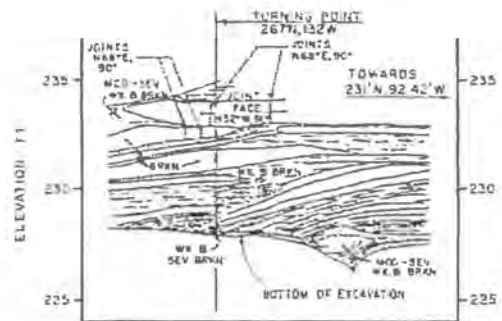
DETAIL - NORTHERN NOTCH IN WEST REACTOR ARC WALL
